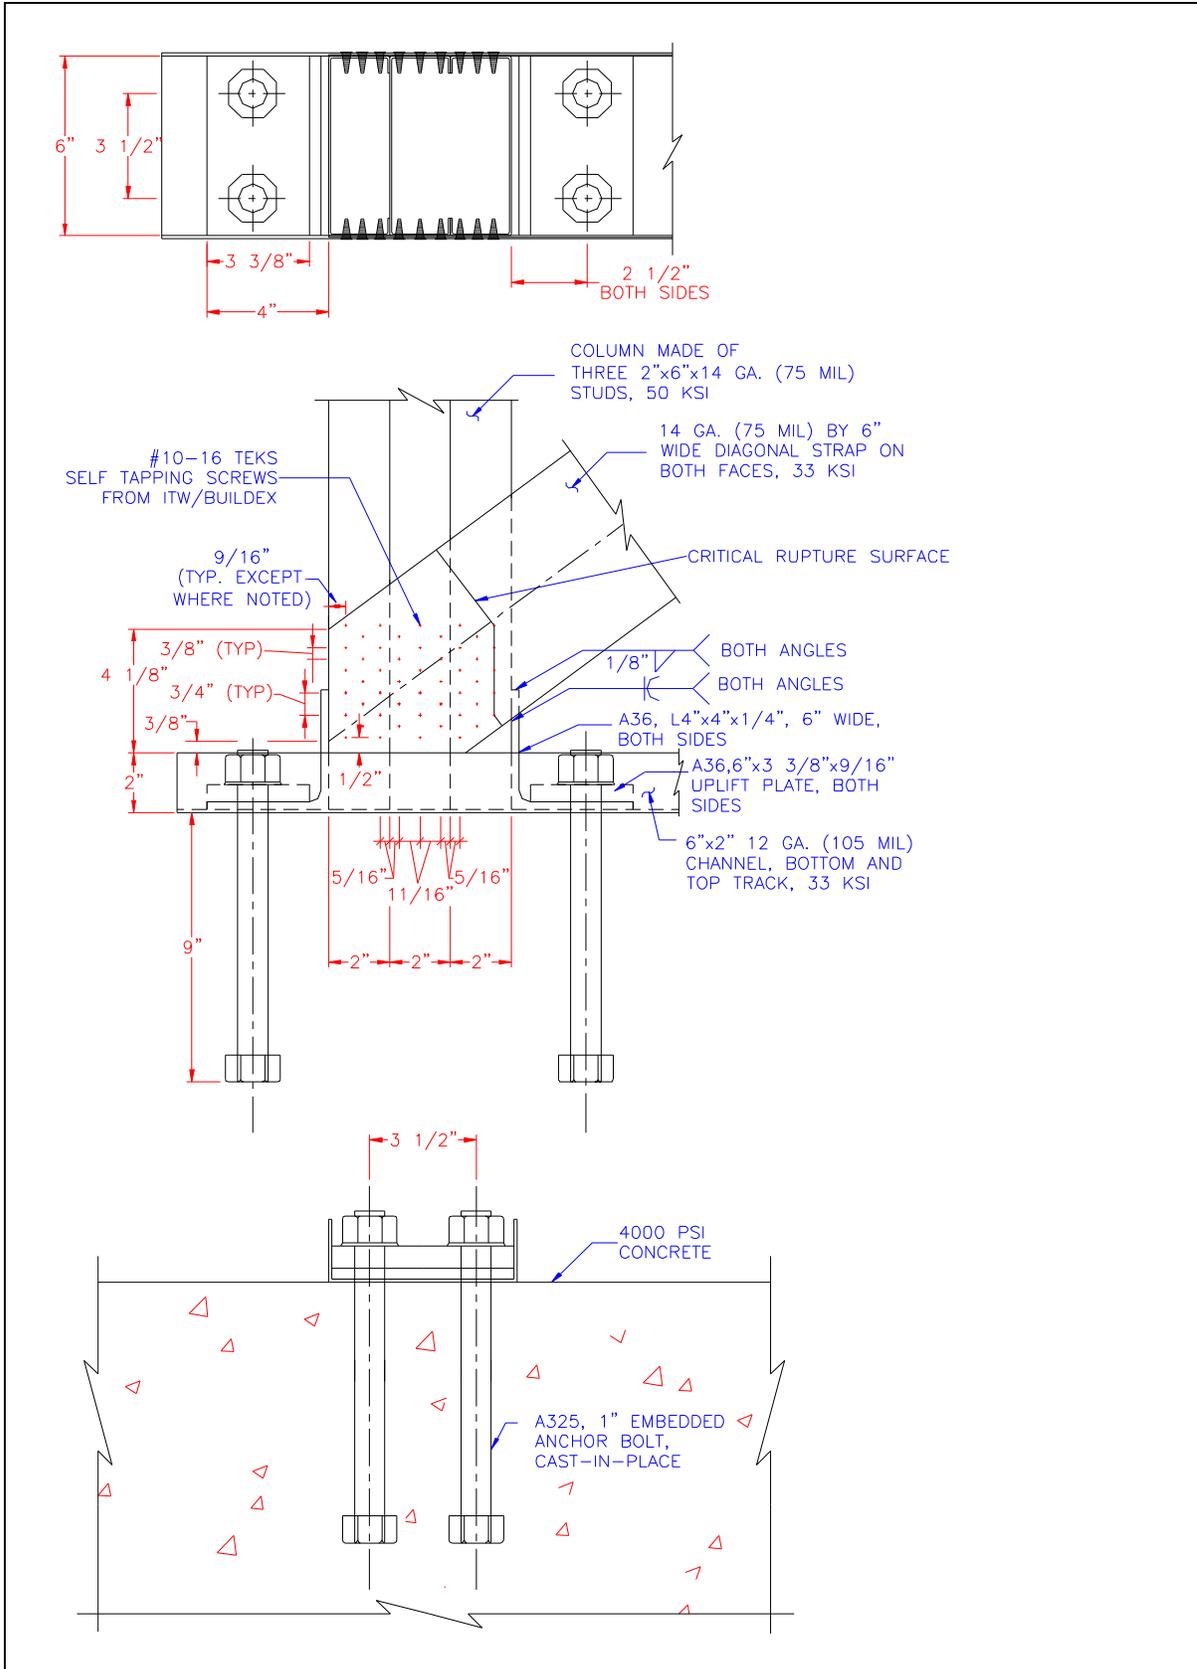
Example connection/anchorage detail – 3rd row of Tables D-5, D-8 - D.17.
